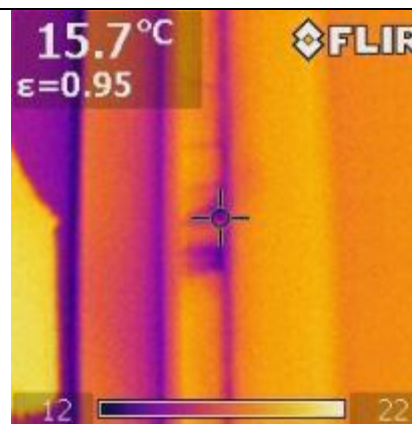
Leakage through crack between window frame and external wall.
